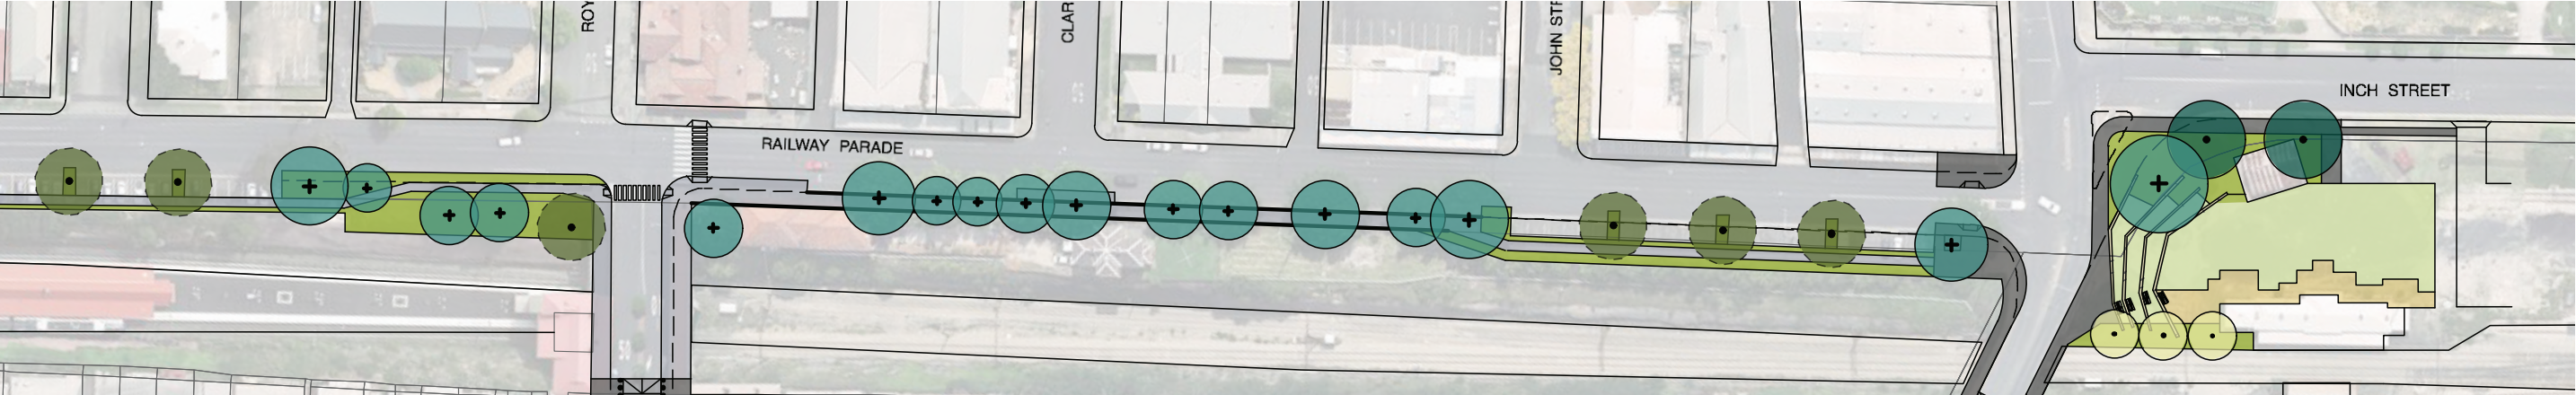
Railway Parade between Eskbank Street and Bridge Street
